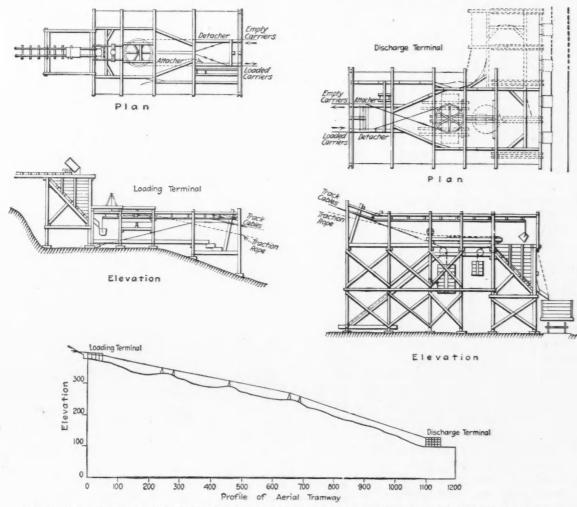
TERMINAL DETAILS OF TRENTON-BLEICHERT CONTINUOUS TYPE AERIAL TRAMWAY
